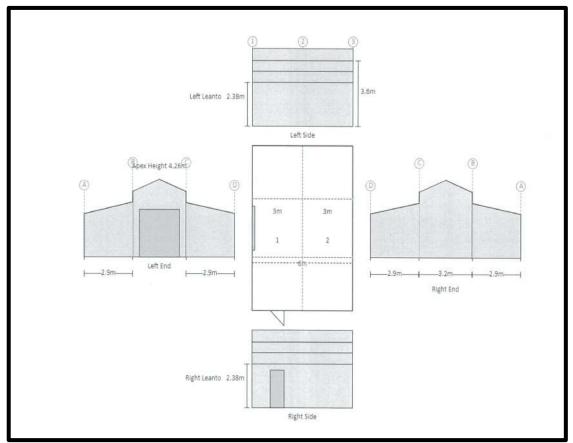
elevations of proposed outbuilding (TNC Engineering P/L, 2017)
